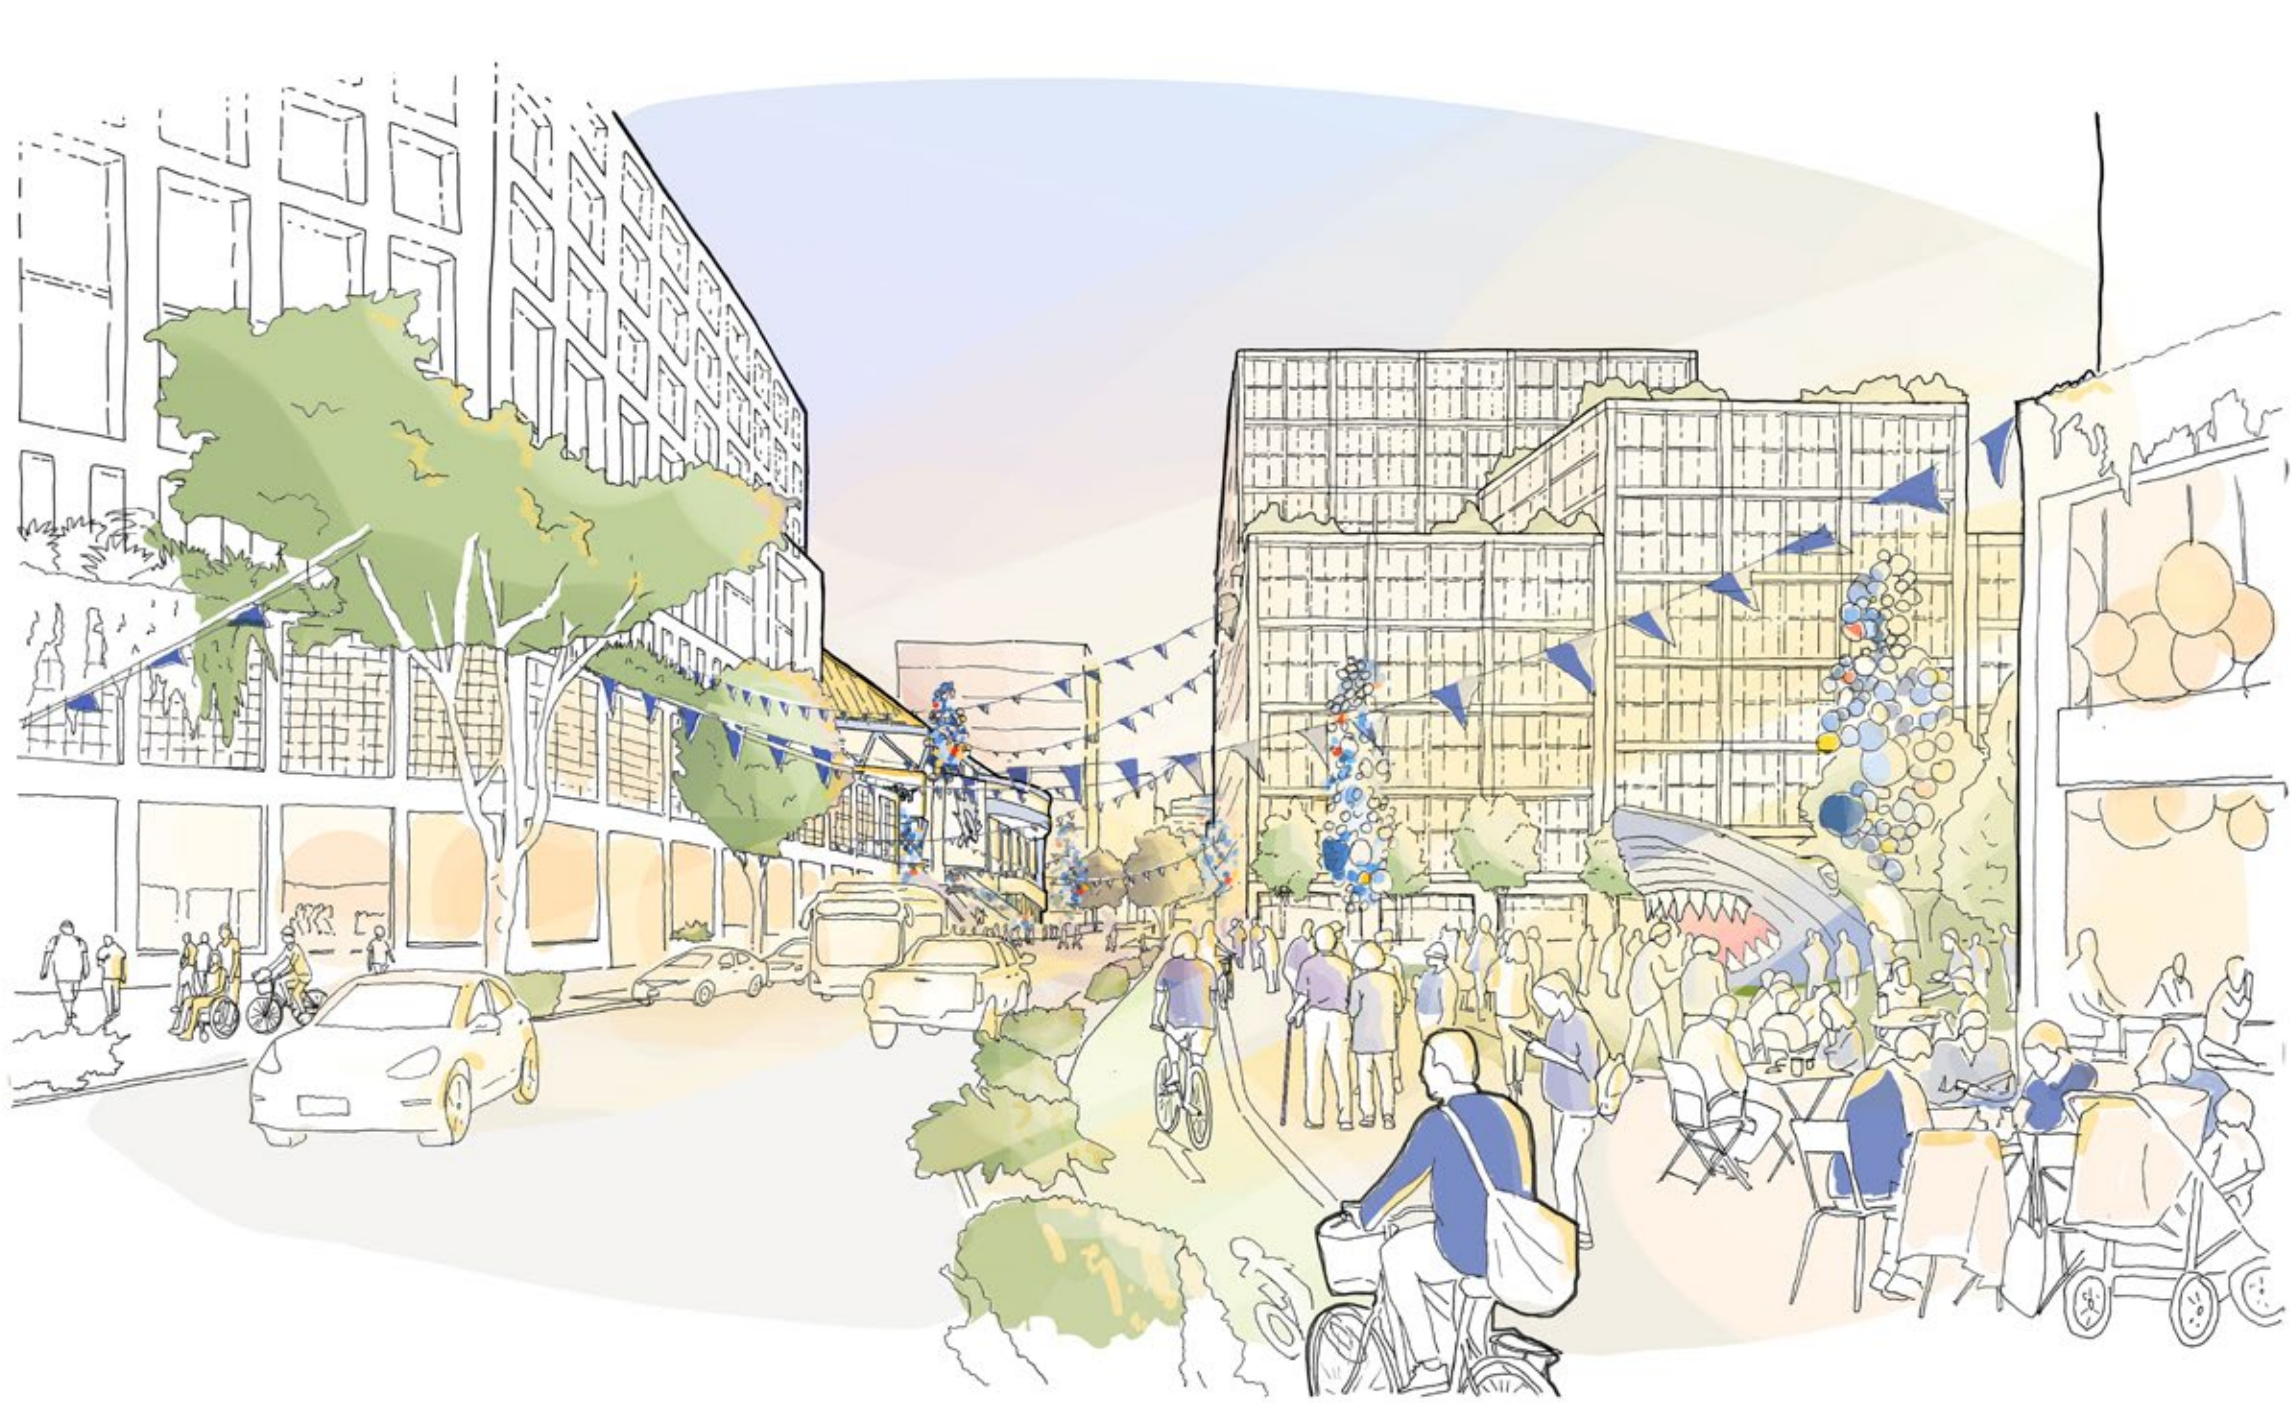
Conceptual Rendering of Proposed Project from North Montgomery Street Looking South Illustrating Proposed Building Form and Massing
